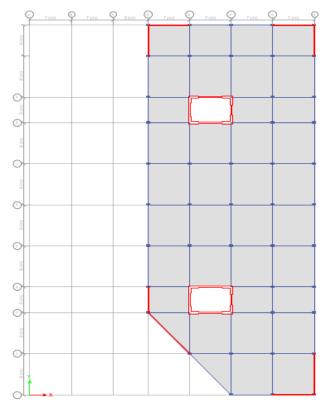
Typical Floor Plan: from 13 to 21 story level : Shear wall At Corner portion
